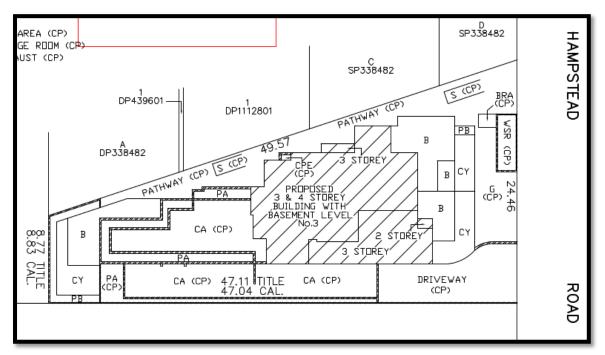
Extract of the proposed plan of subdivision, dated 21/04/2021.
